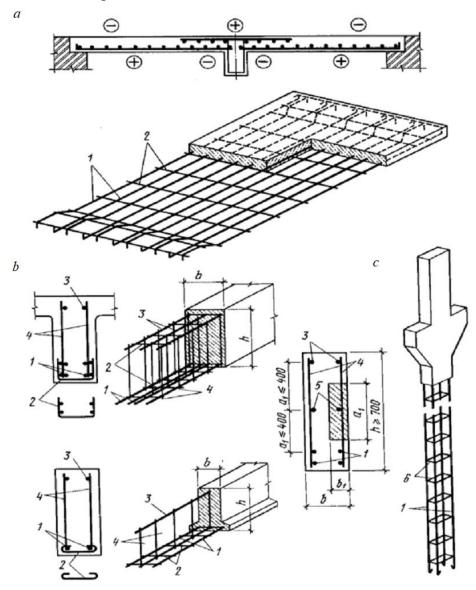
Reinforcement of RCS: a - slabs; b - beams; 1 - the longitudinal reinforcement; 2 - the constructive reinforcement; 3 - the mounting reinforcement; 4 - the shear reinforcement; 6 - lateral ties of column cage
